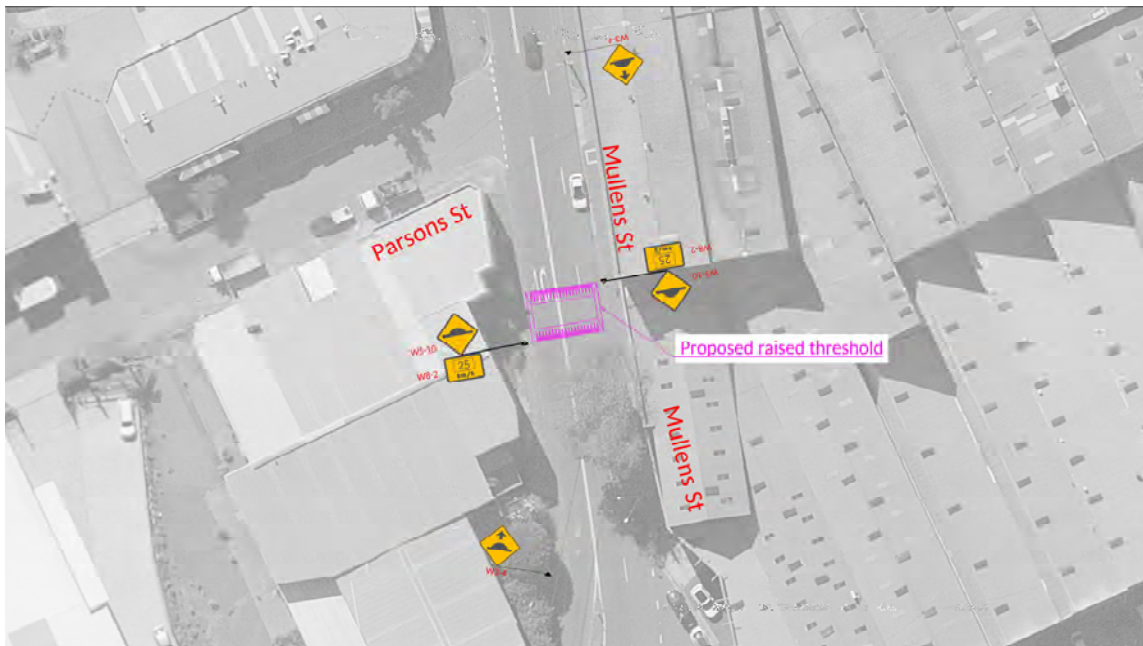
Mullens Street between Robert Street and Parsons Street proposal.
